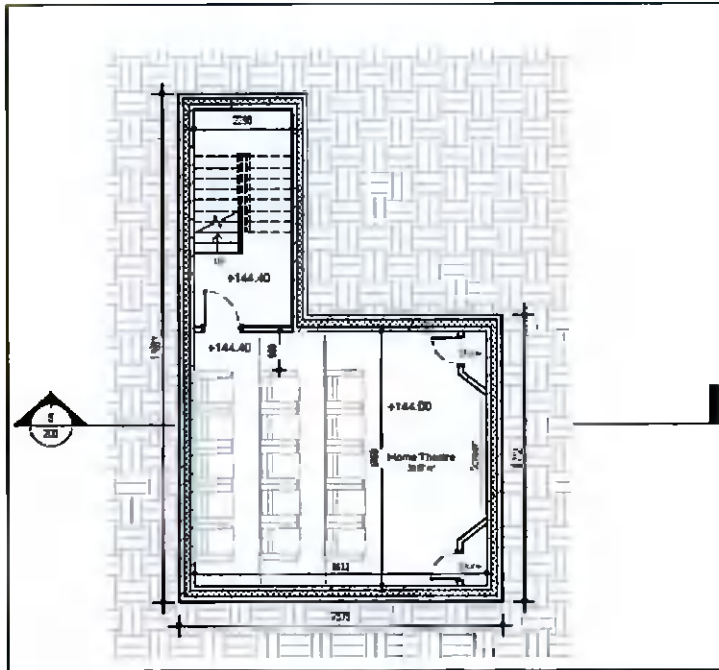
Proposed Basement Floor Plan (Drawing No. 103).
